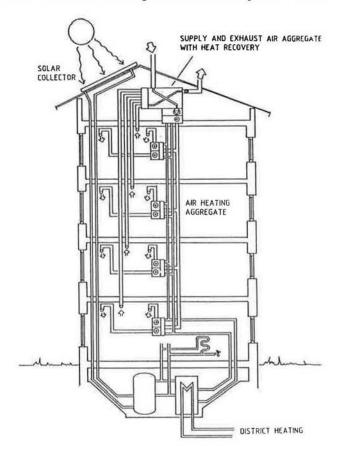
Principle of the awarded forced air heating and ventilation system in the Svenska bostäder/BPA concept. The system design has been made using laboratory measurements in a full-scale apartment.
